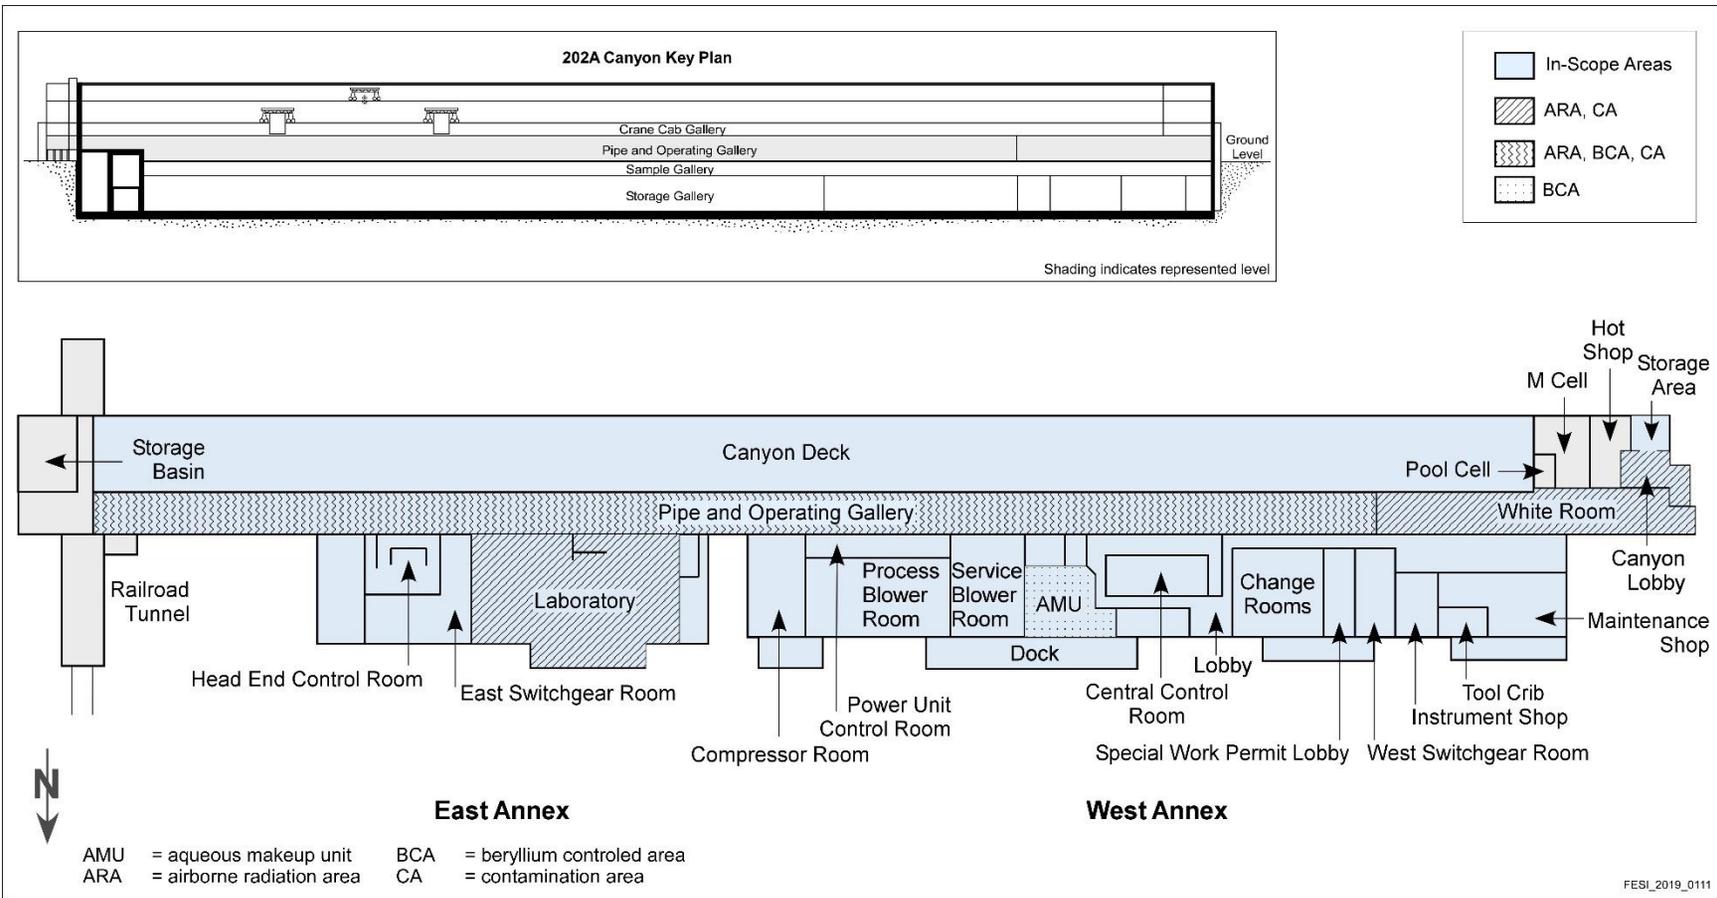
202A Building Plan View – Pipe and Operating Gallery Level
